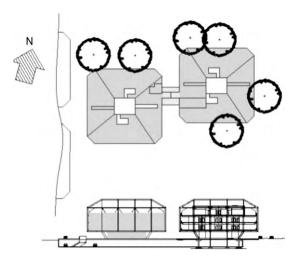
Section and plan of a typical floor with zone layout and existing shading provided by trees and surrounding building.
